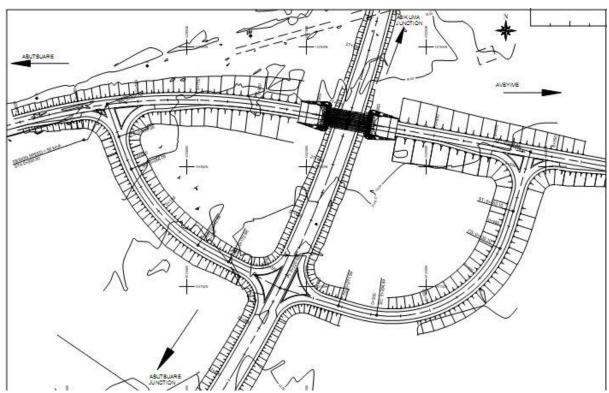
Layout of Volivo Interchange at CH. 29+350 on Section 1 Project Road
